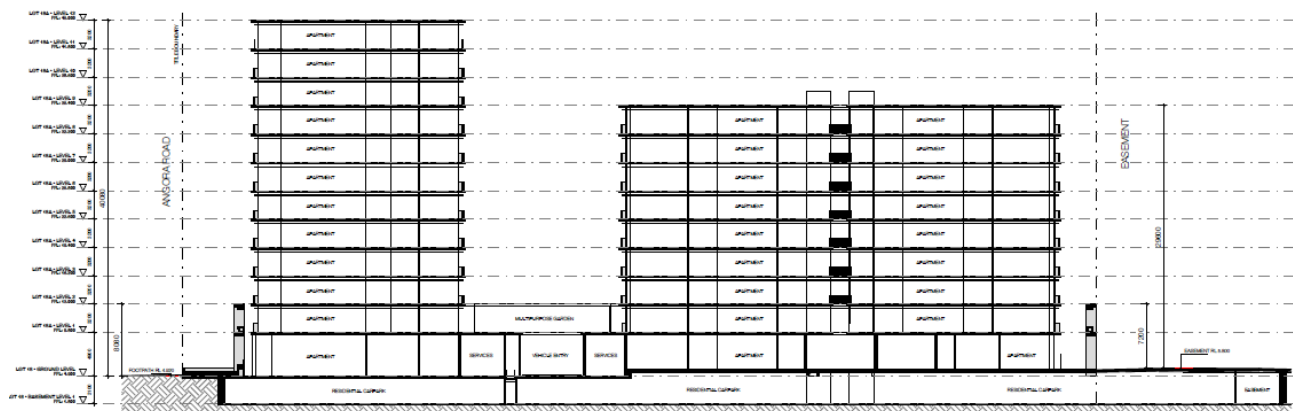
Extract from proposed development Section plan For Site 18A(Carr 24047-TP2-3002).
